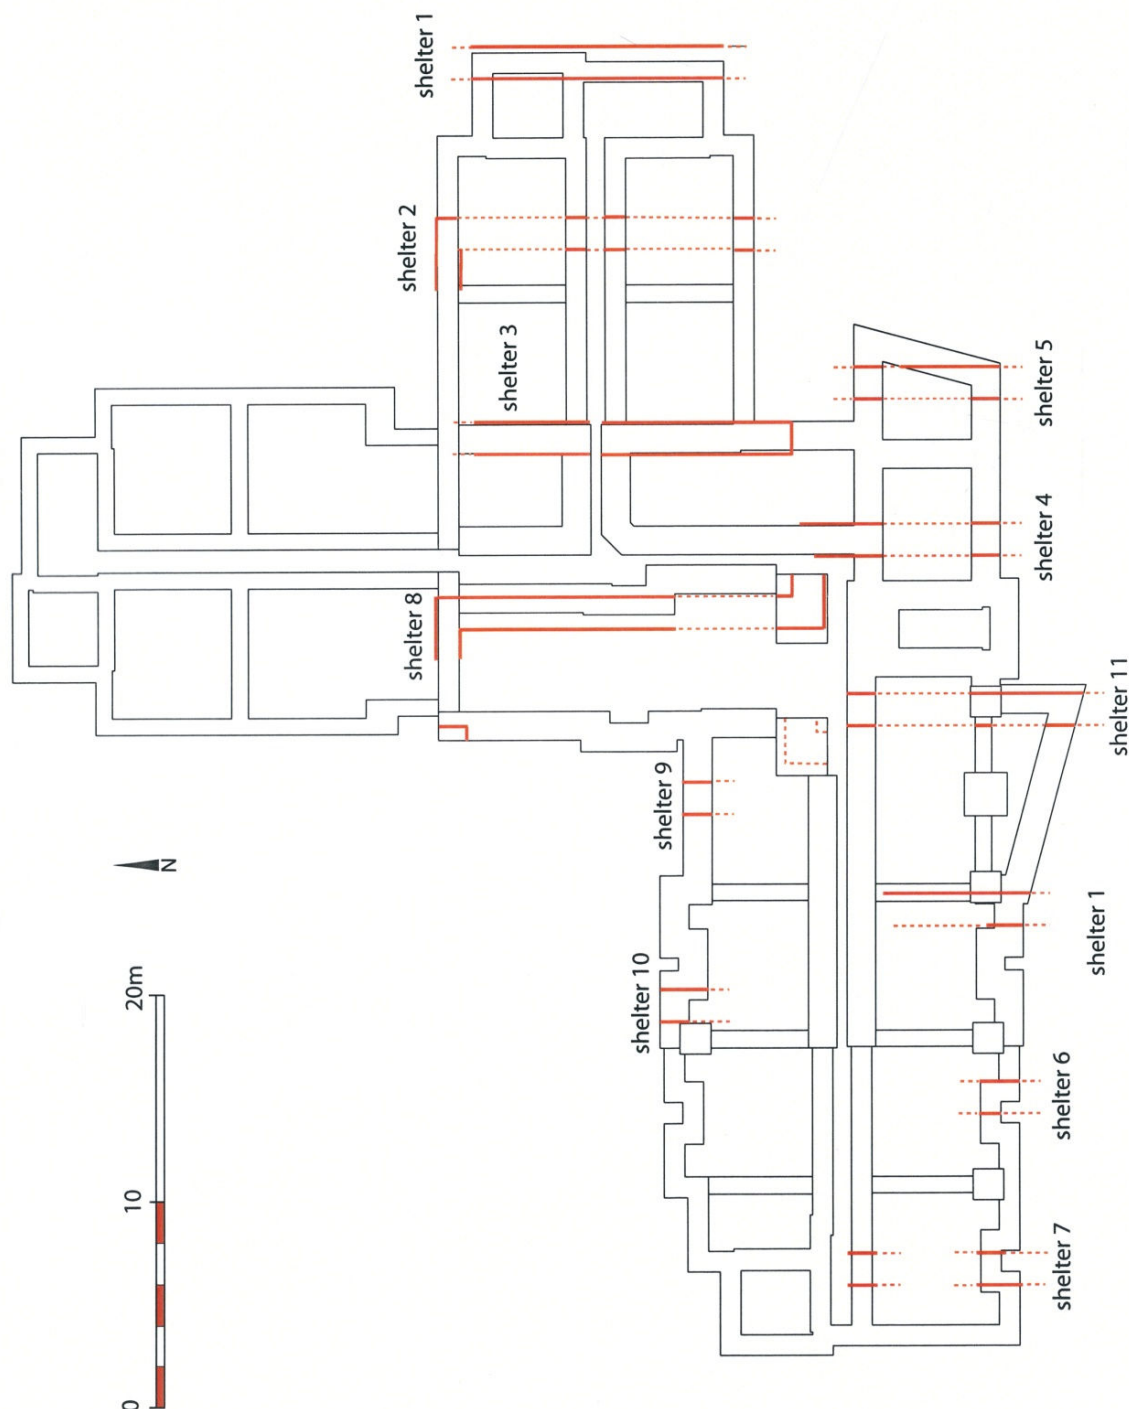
Plan of foundation trenches showing layout of air raid shelters
